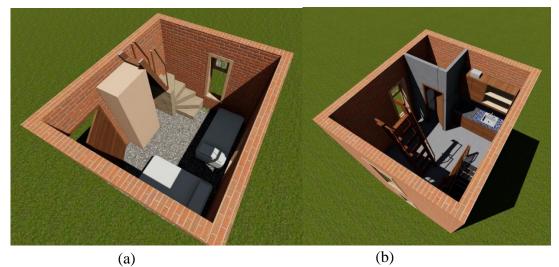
(a) 3D view of the proposed ground floor layout (b) 3D view of the first floor
